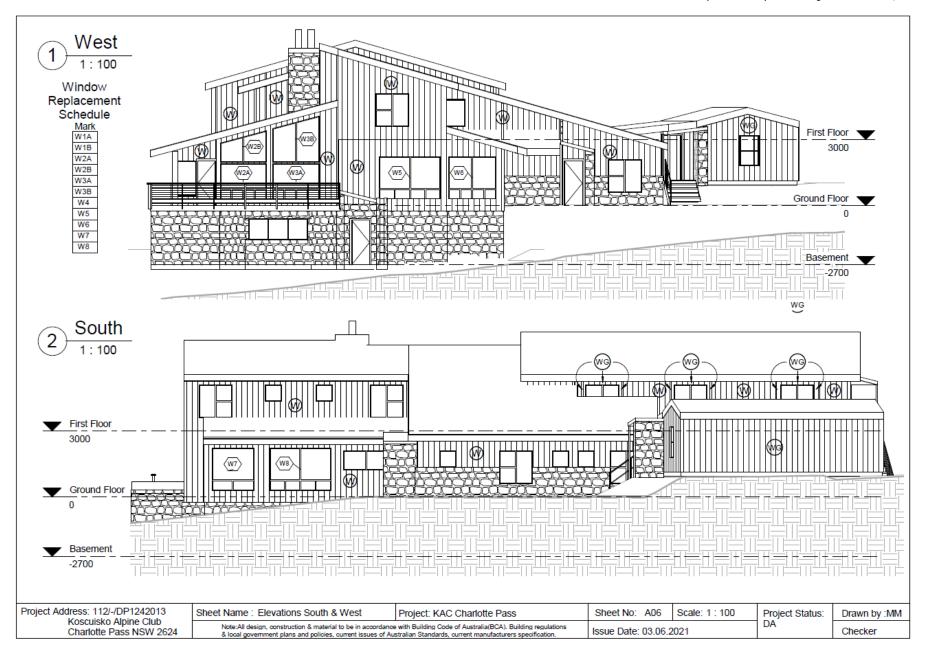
West and south elevations showing cladding replacement (W and WG) and window replacements
